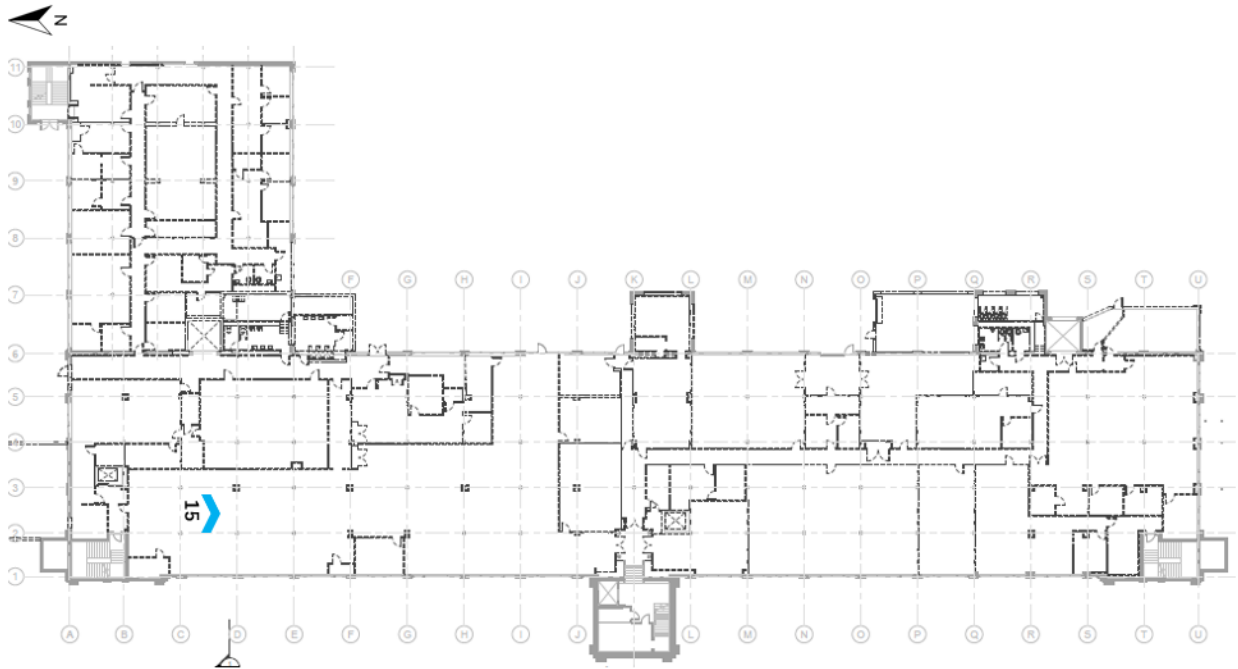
Photo Key Plan – Main Office/Factory Building – Stair Tower
